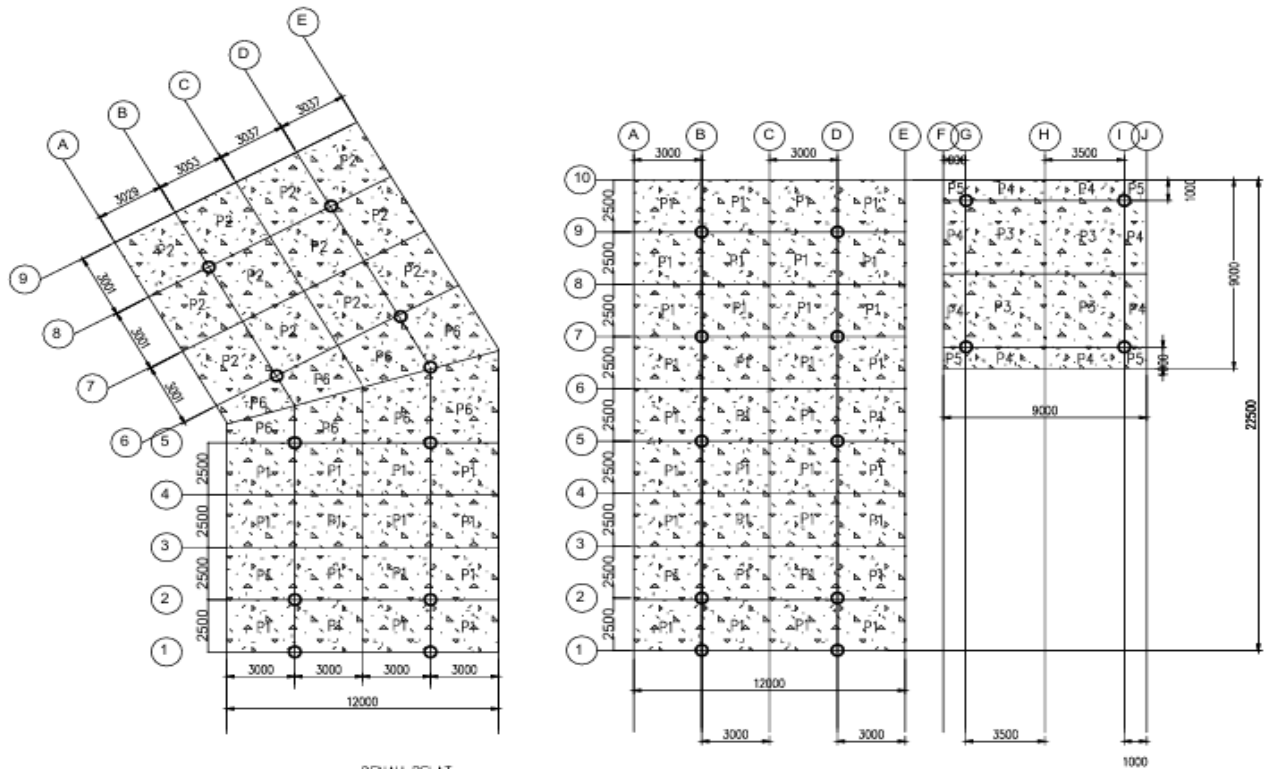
Slab plan of the ITK canteen at 1 : 200 scale
